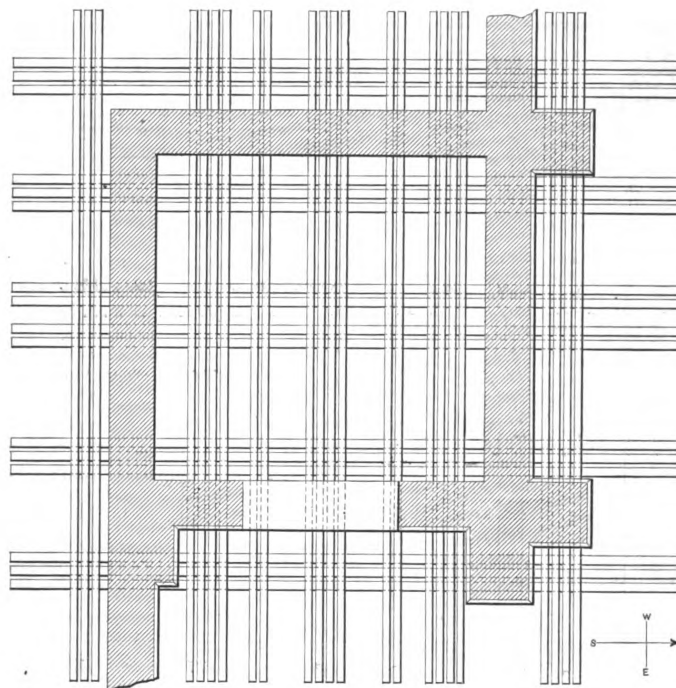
Plan of Tower Loading, Showing Arrangement of Track.
